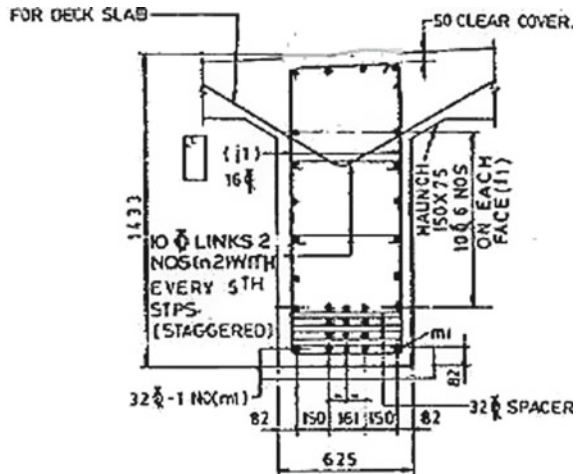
Cross-section of T-beam bridge girder for 14 m span
